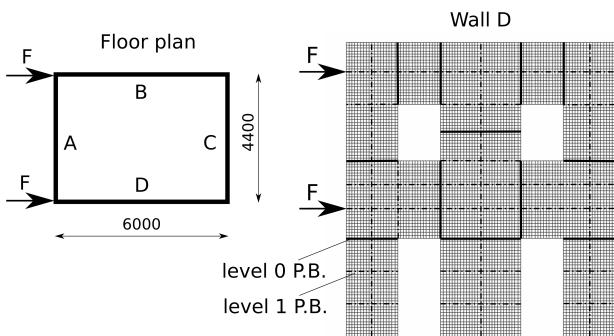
Perforated wall: plan of building, hierarchic partitioning of Wall D and applied loads (P.B.=Partition Boundary)
